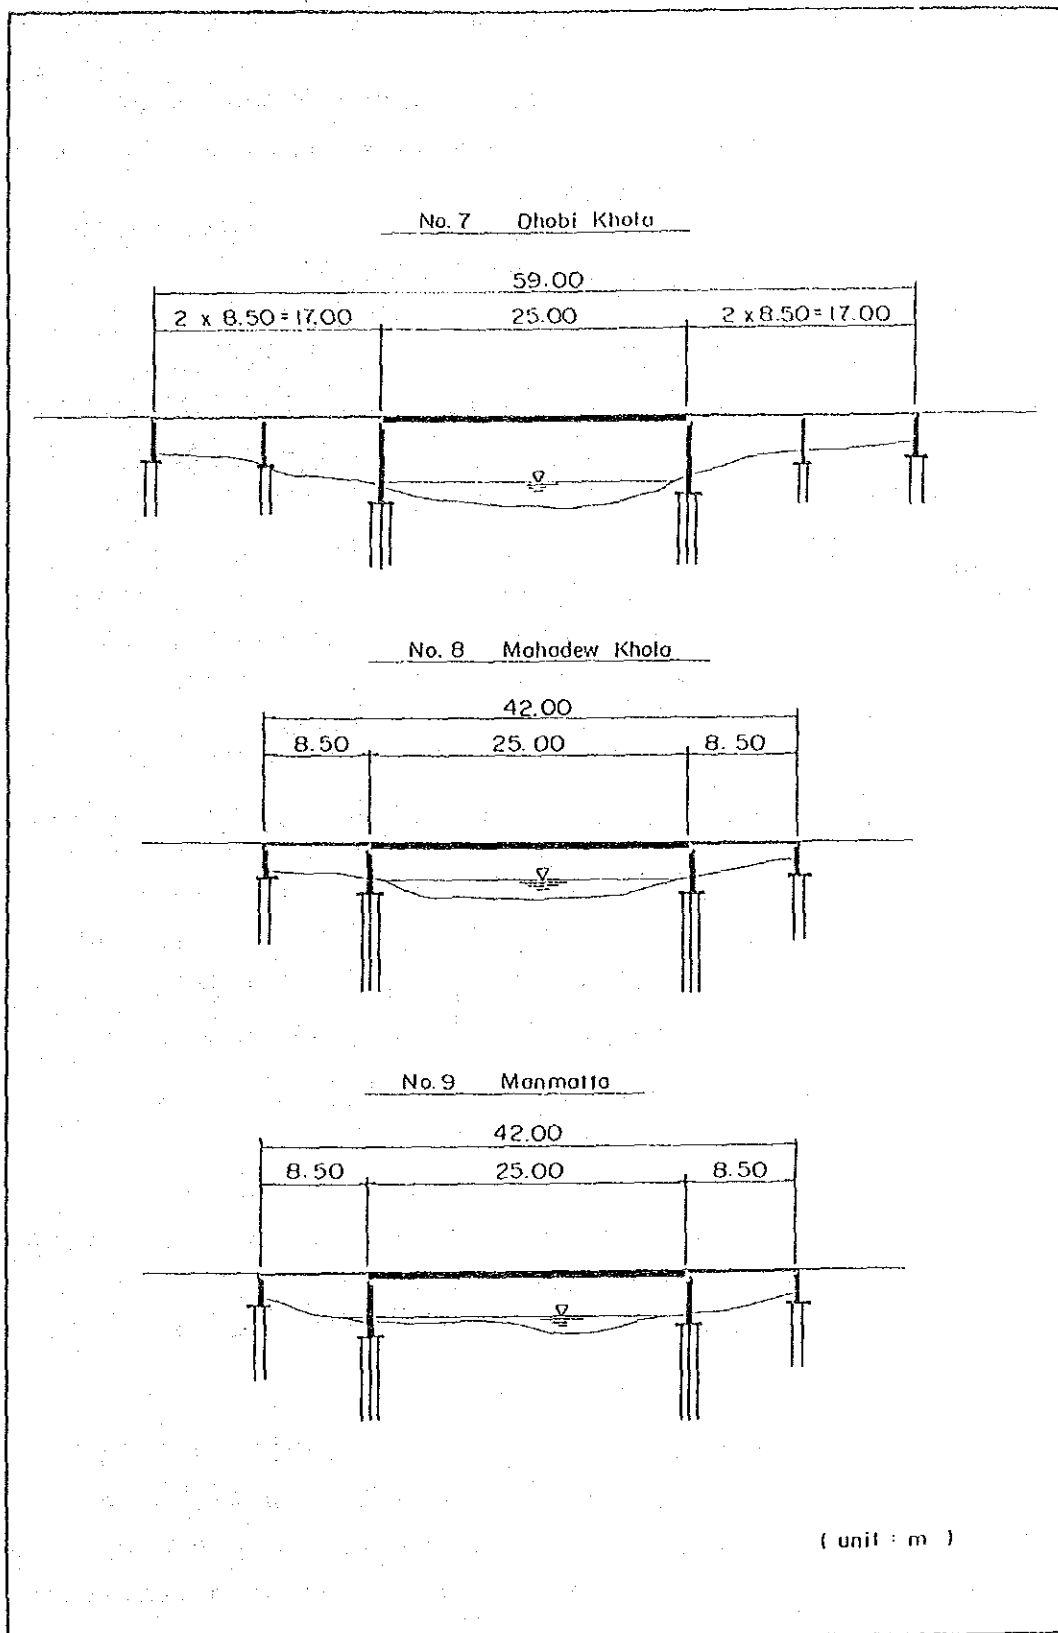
SPAN ARRANGEMENT OF PLANNED BRIDGE (continued)
